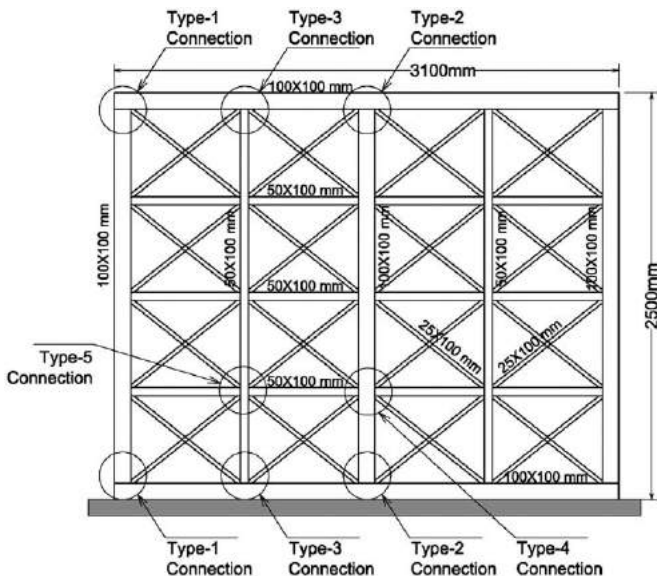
Details of member sizes and types of connections used in *dhajji* wall specimens.
